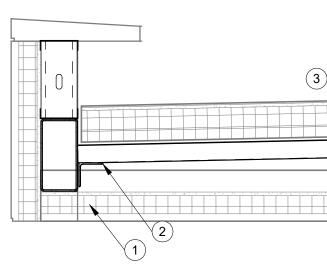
WF BEAM RE: PLAN 2) PL 1/4x4x4 TYP 3 COL RE: PLAN 4 KNEE BRACE RE: PLAN
